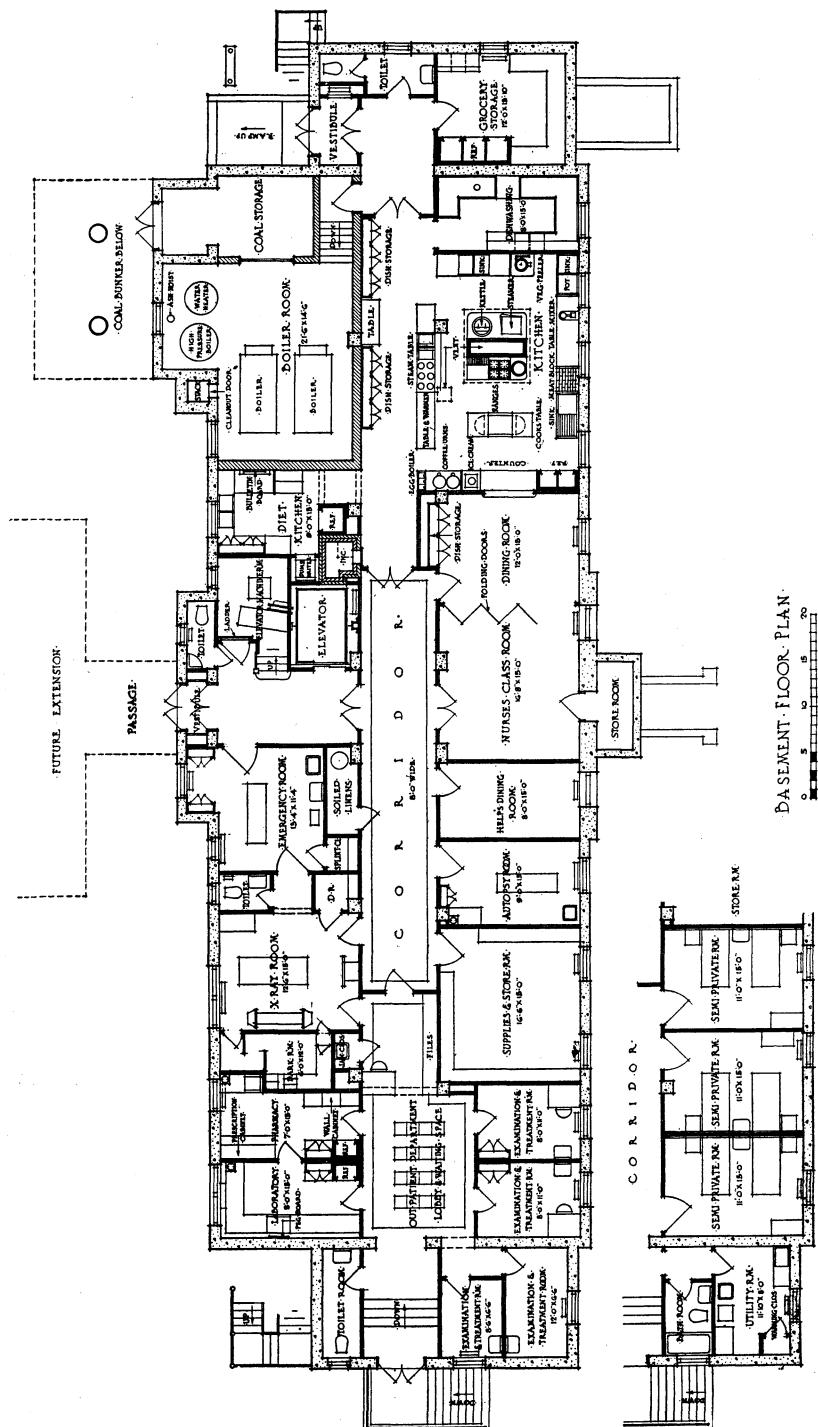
The basement or ground-floor has plenty of light and air.
